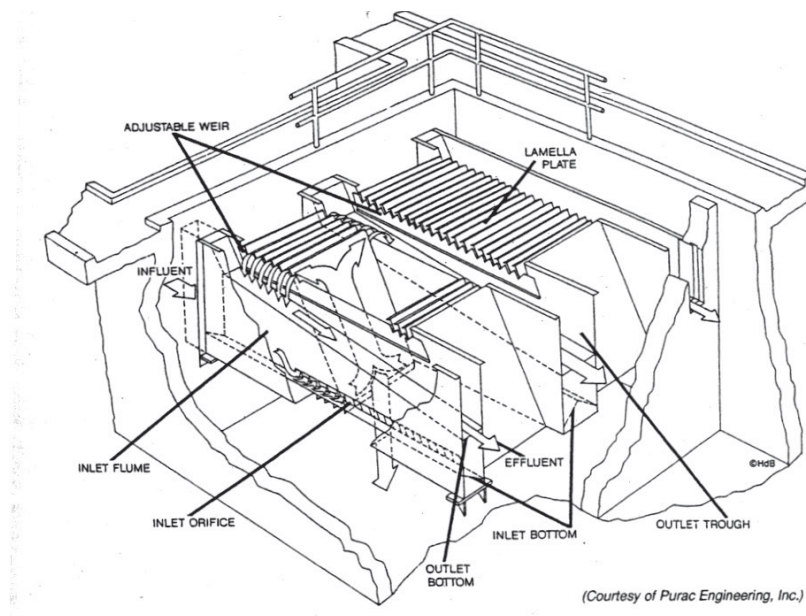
Technical drawing of a plate settler / sed basin outlet (Willis 1990)
